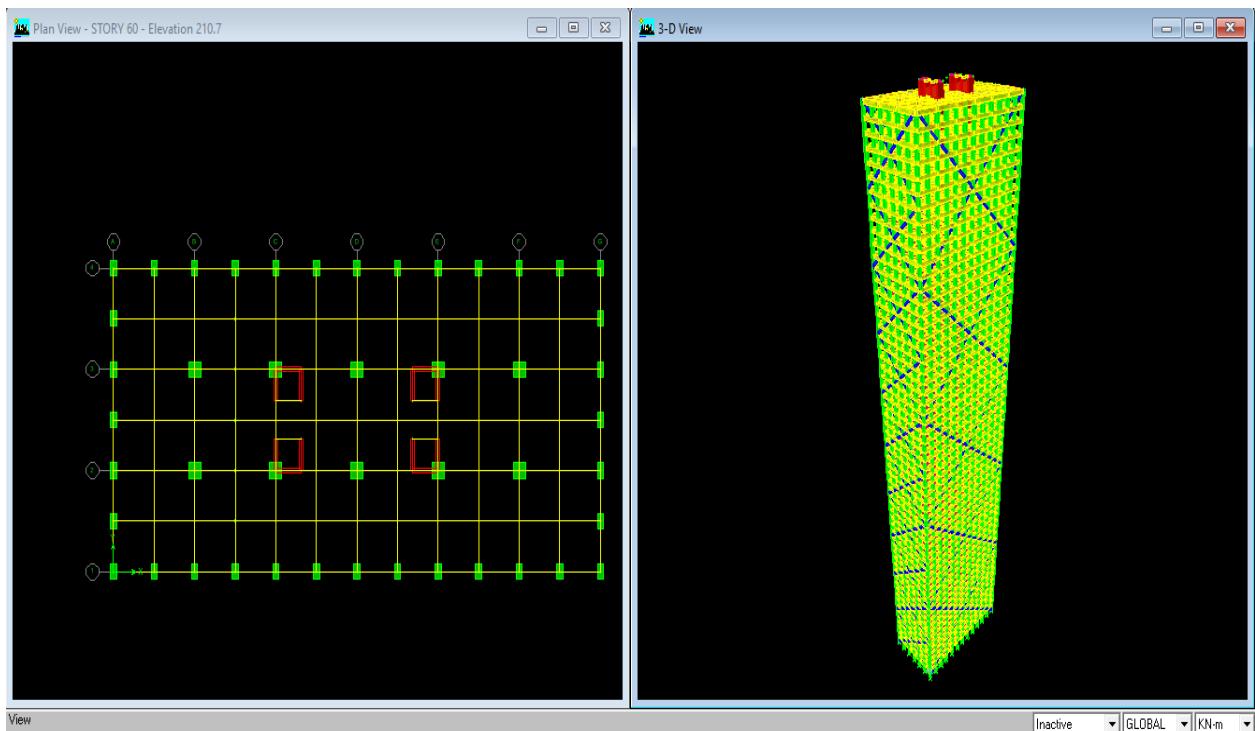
Plan view and 3-D view of 60 storied Braced Tube structure building
